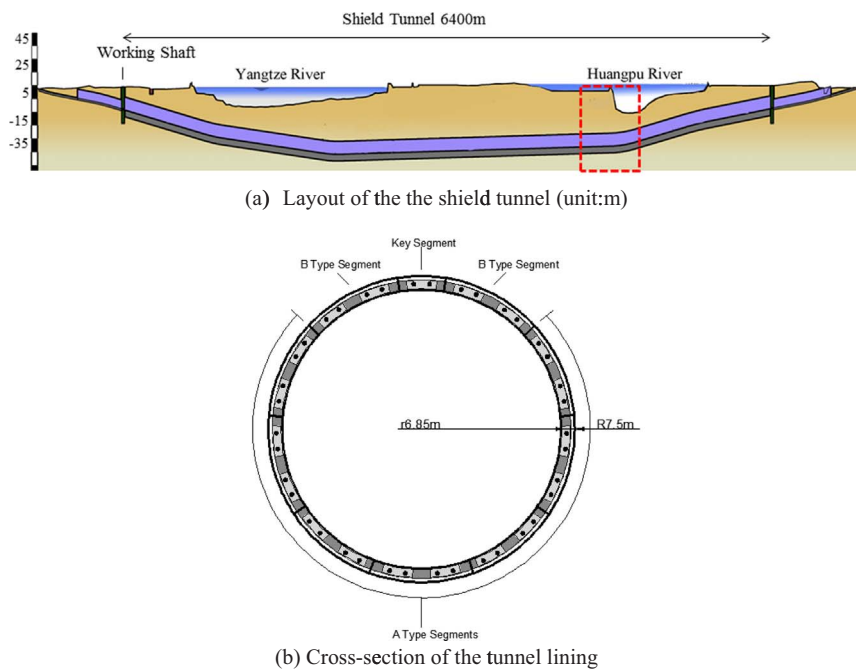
Prototype of the Riverine passage shield tunnel (a) layout of the shield tunnel (b) cross-section of the tunnel lining.
